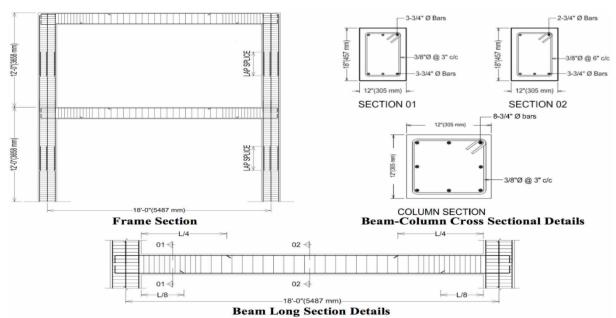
Steel reinforcement details of control frame used by Rizwan et al (2018) as well as candidate model in this study.
